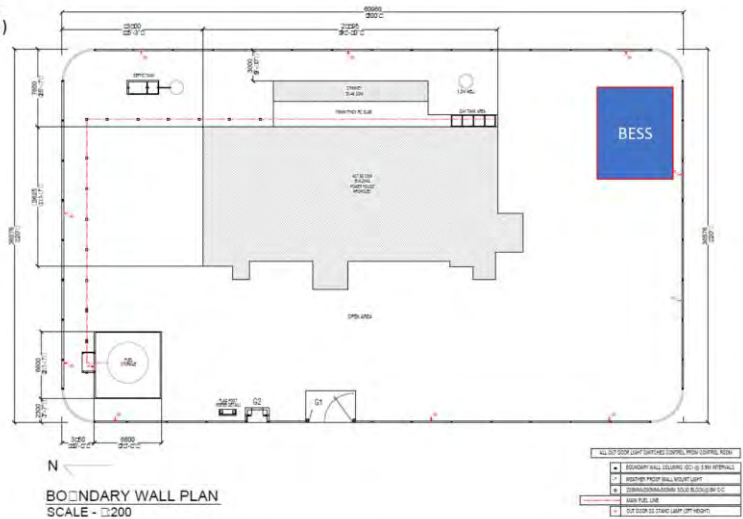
LOCATION OF BESS/NEW POWERHOUSE L.MAABAIHOO
